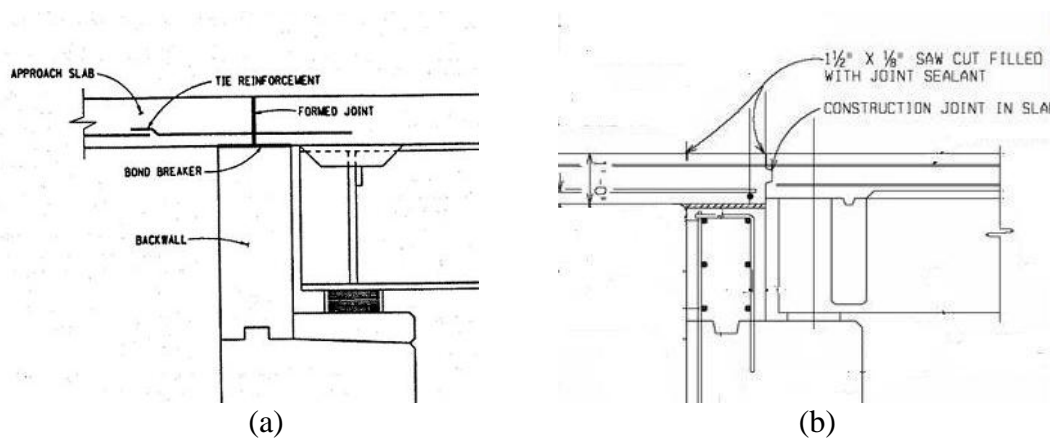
Deck sliding over backwall: (a) NYDOT and (b) MDOT
